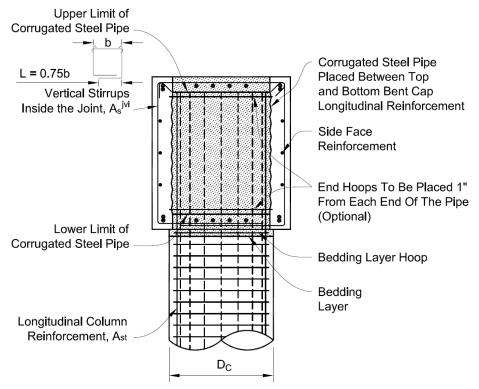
Cap Pocket Joint Shear Reinforcement Details (Section)—SDC B
